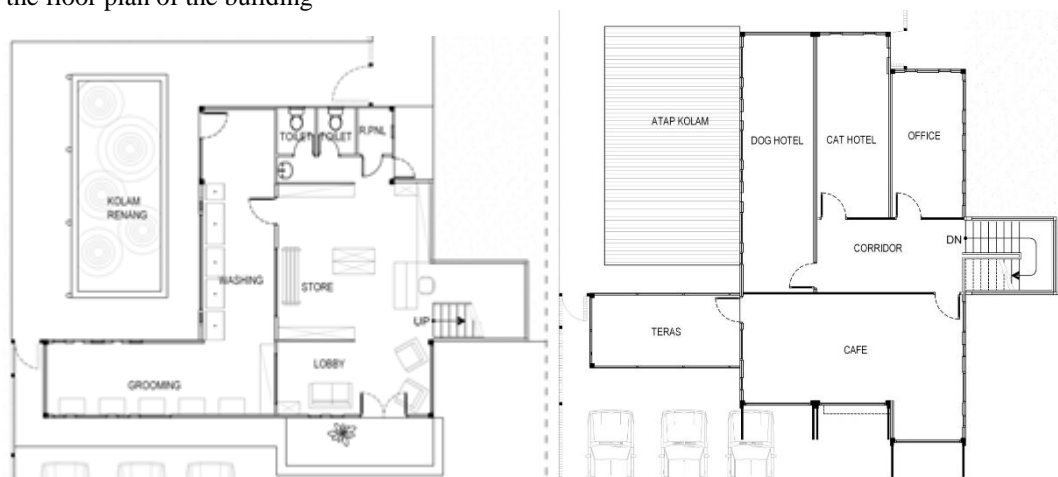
Ground floor and second floor plan of the pet salon (Courtesy: Magnus Cipta Estetika, Pte.Co)
